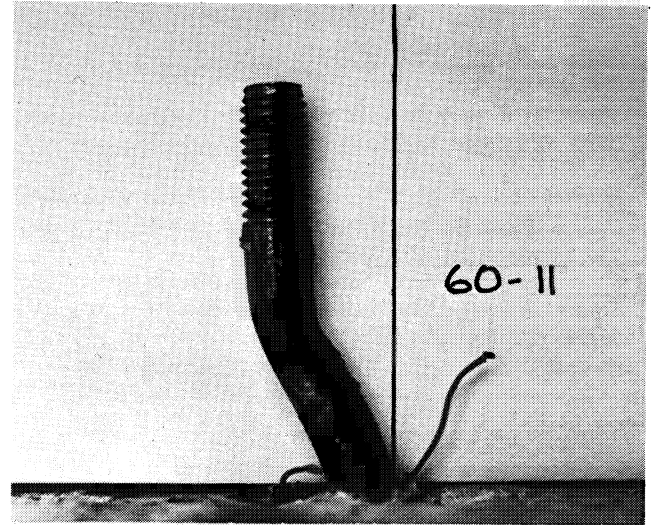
Anchor bolt failure; load applied at 60°
